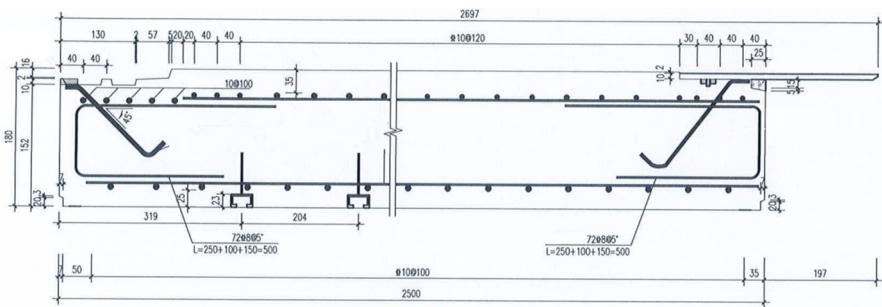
Layout drawing of pipe steel bar(unit: mm).
